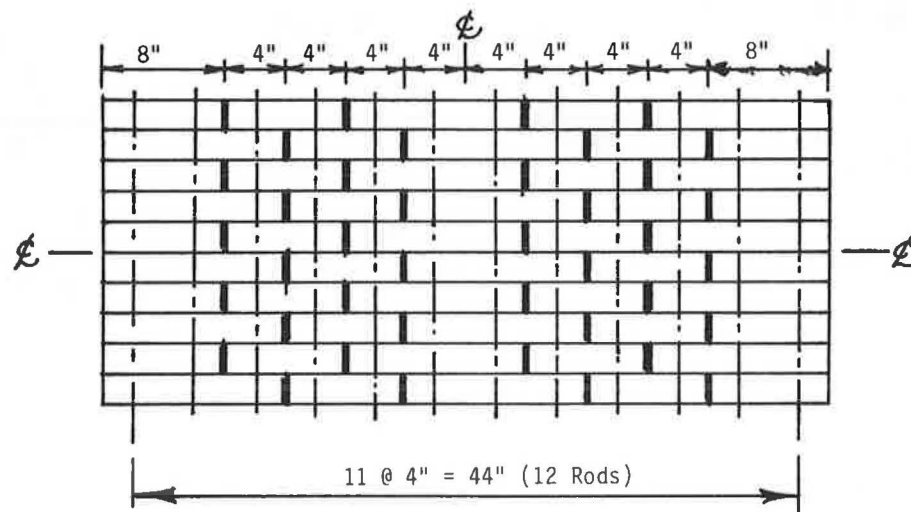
Plan view of butt joint pattern for top layer; bottom layer is mirror image.
